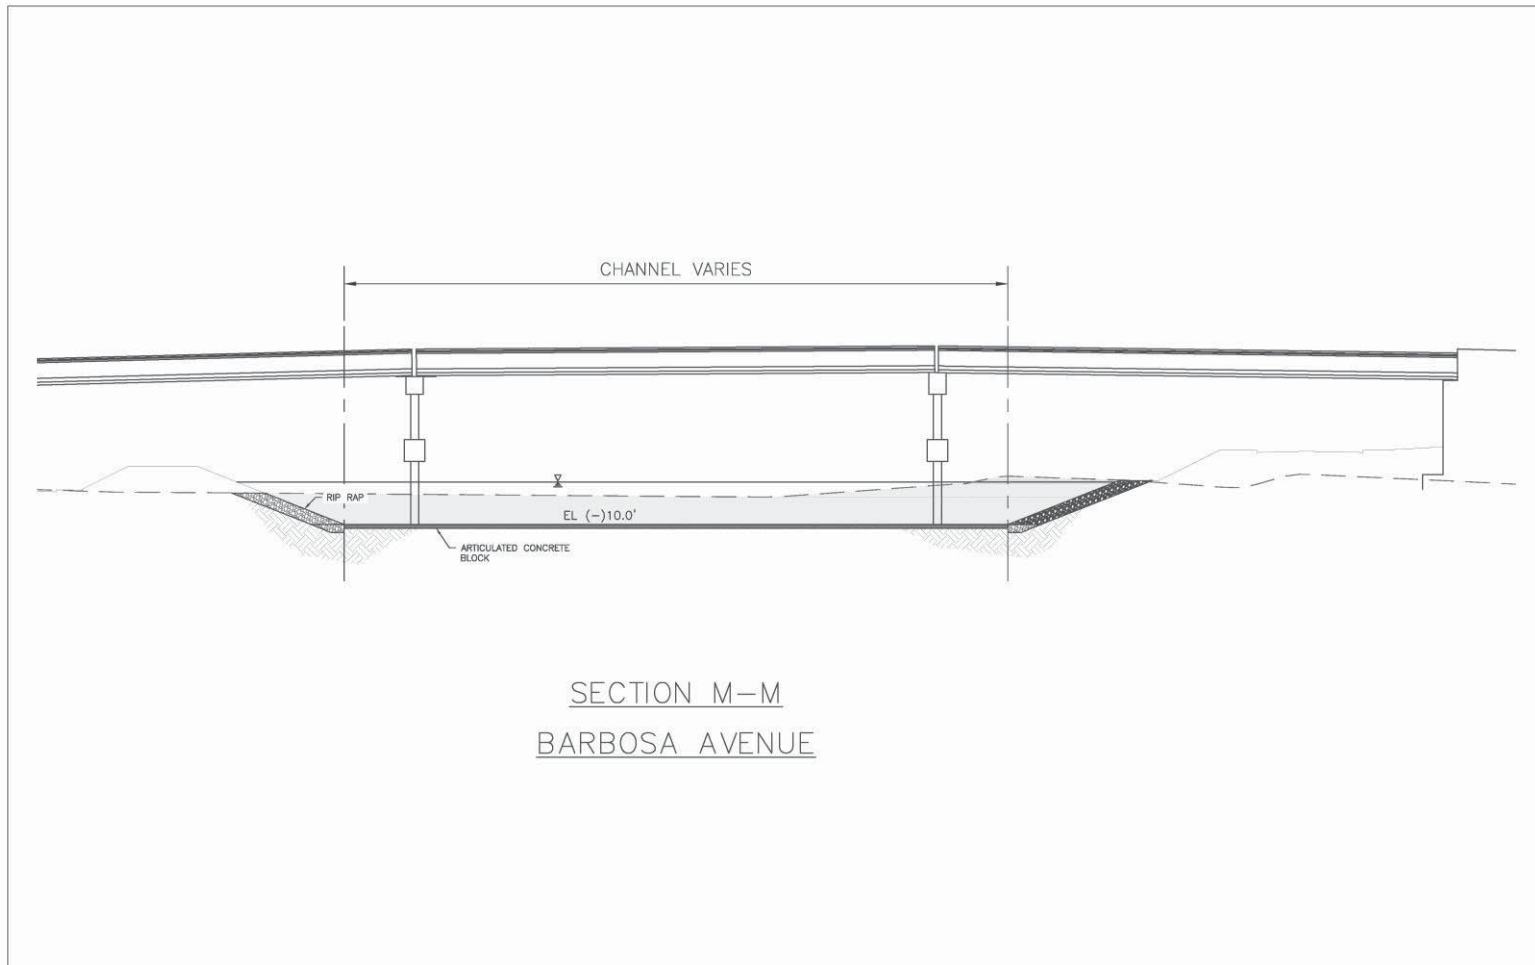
Cross Section M-M, Dr. Barbosa Avenue Bridge
